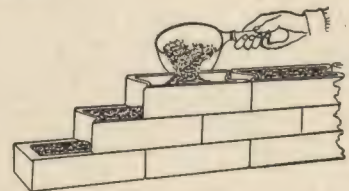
Pouring Glass Brick. Showing also method of wall construction.
